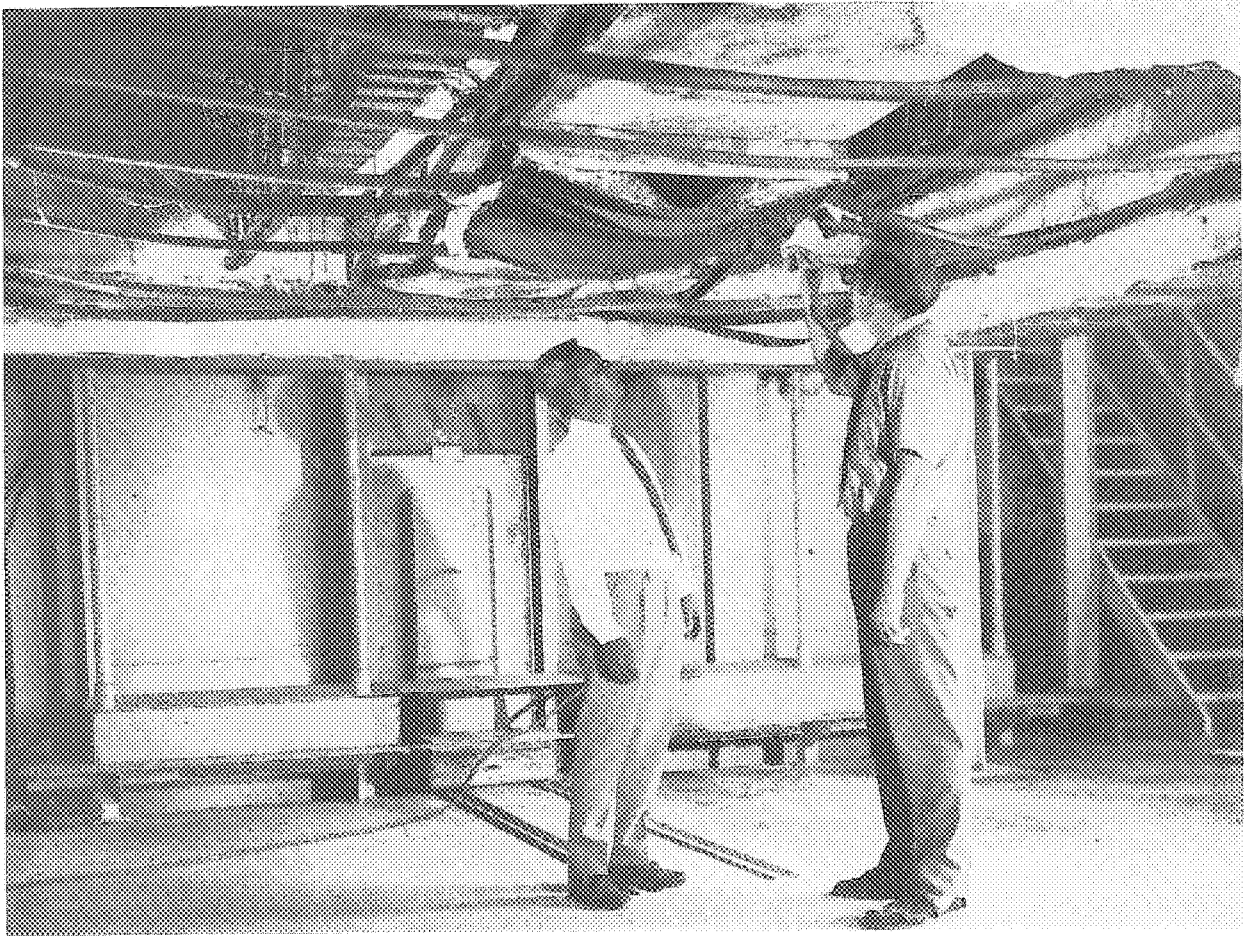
ASSEMBLY NO. 2 AFTER FIRE TEST
